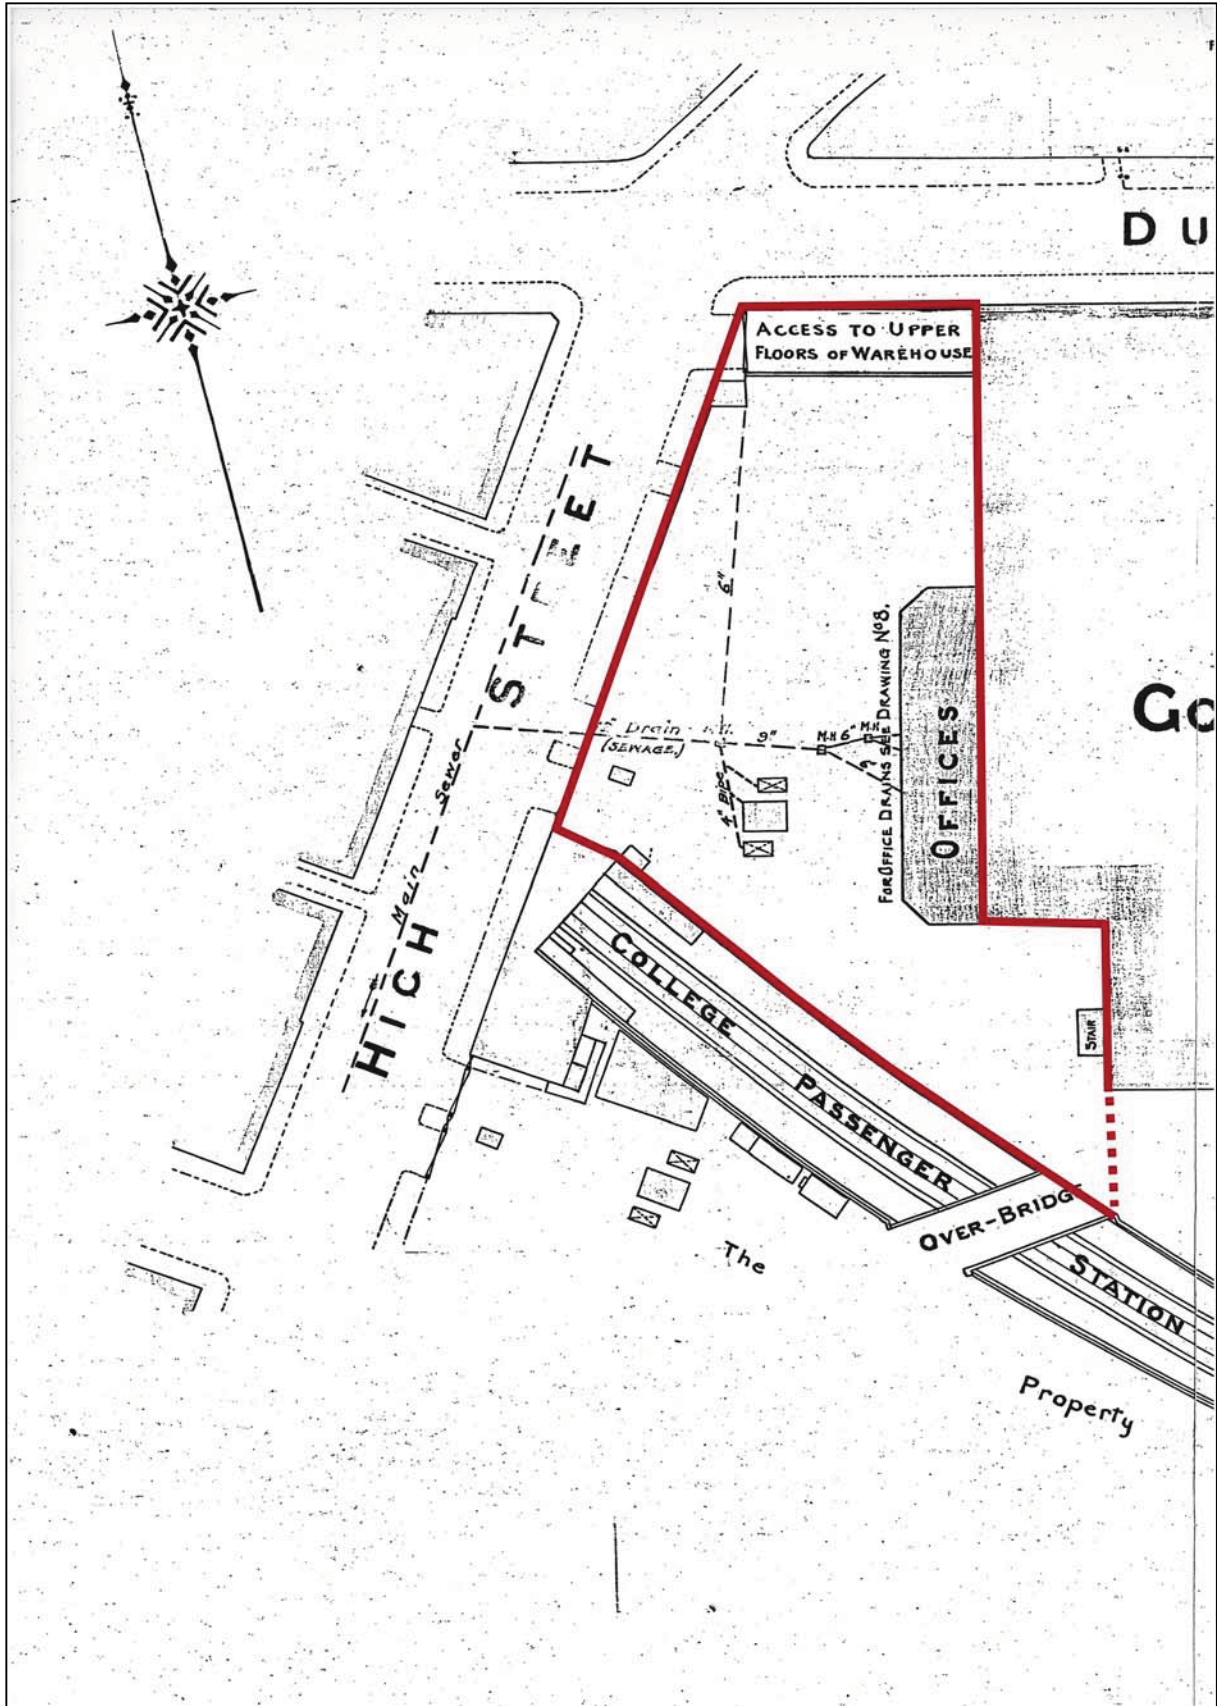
Detail defining extent of 'Ground to the West of the former High Street Goods Station' based on North British Railways 1904 plans.
